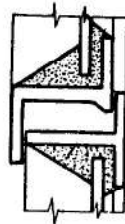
DETAIL THROUGH BOTTOM OF TOP-HUNG VENTILATOR
